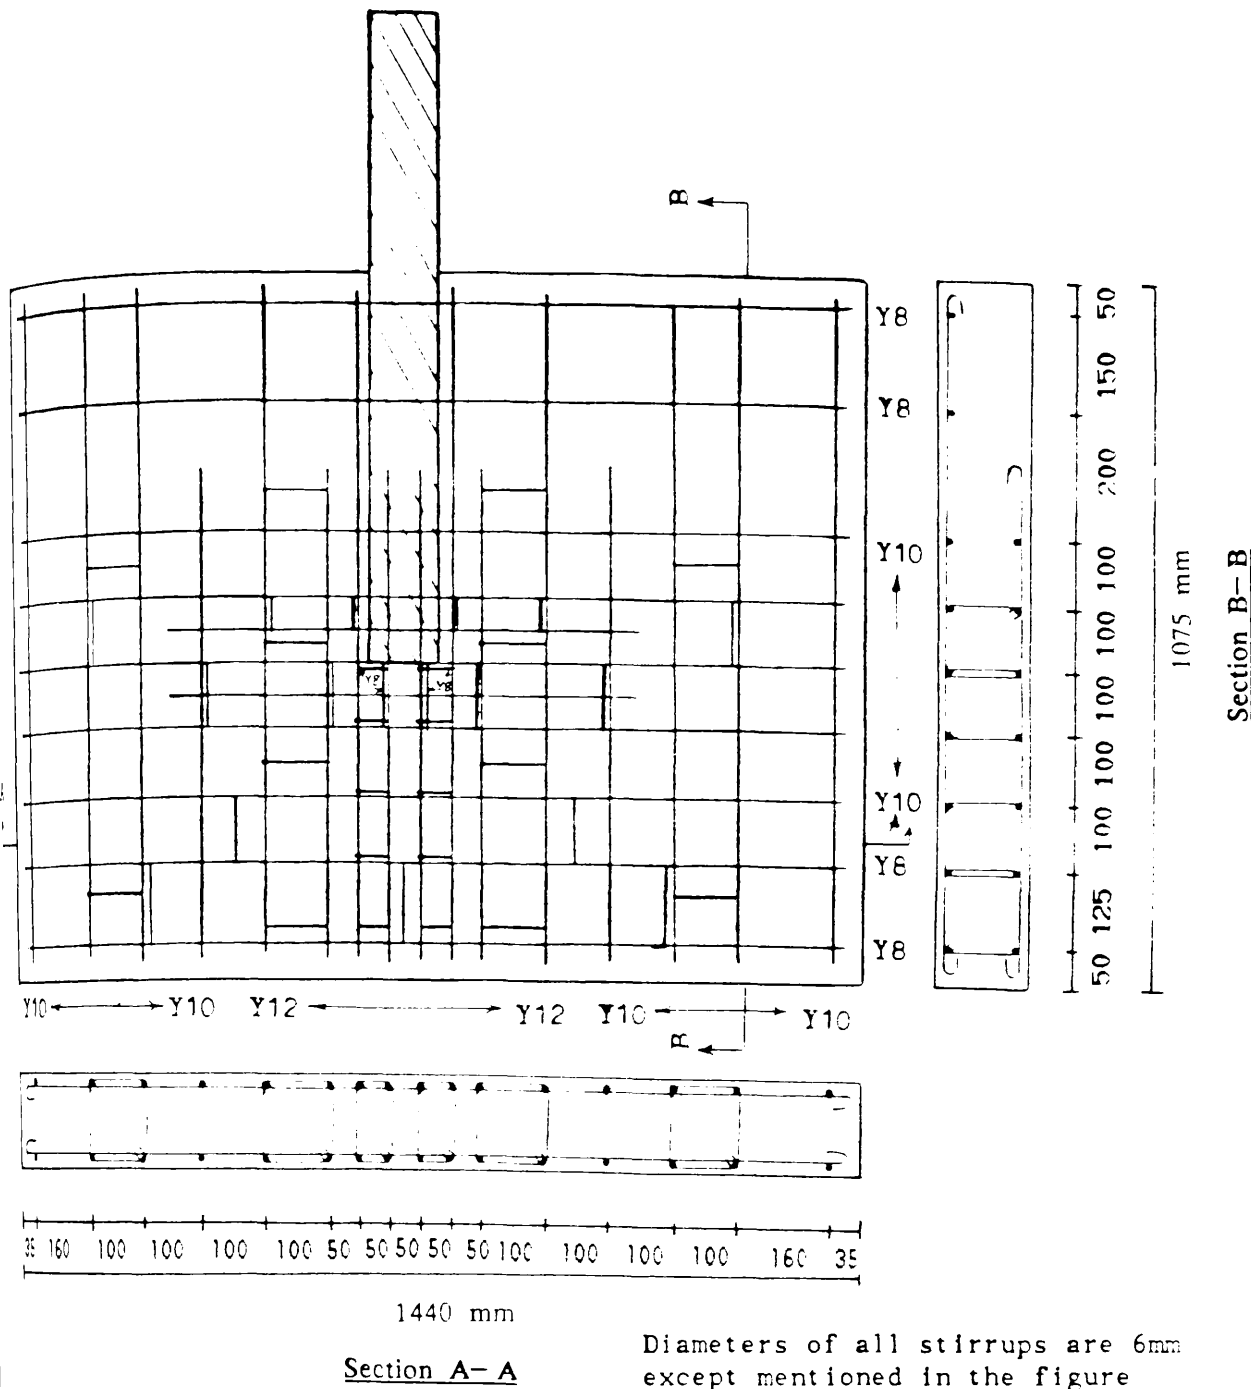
a) : Arrangement of top reinforcing bars including closed vertical stirrup in the slab of model MS9
